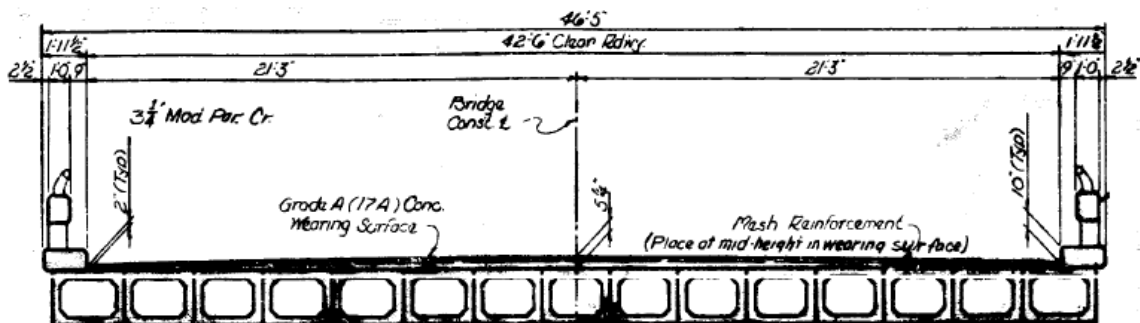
Cross Section of P/S Adjacent Box Beam Bridge
